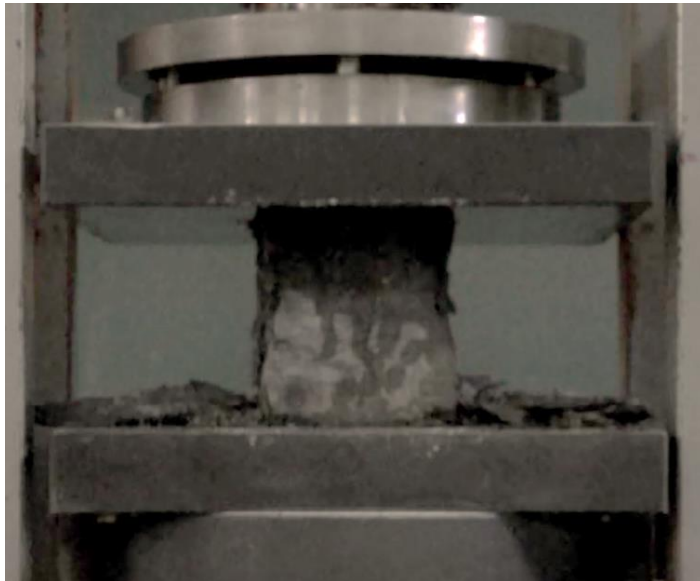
Concrete Cube Specimen at the Moment of Failure at the Compression Testing Machine
